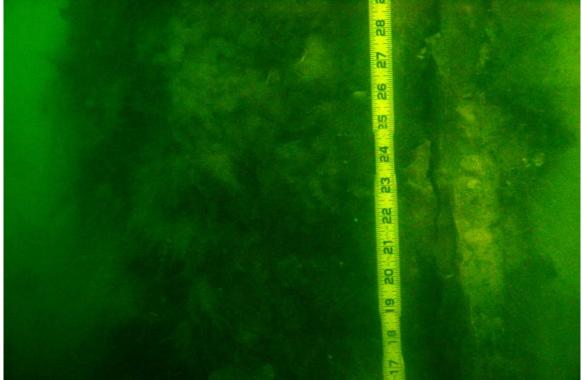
SPALLING (NOTE DELAMINATED CONCRETE) AT PILE 12 OF BENT 146
